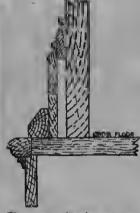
Section of Curb and, Base Moulds of Pulpit on Church Floor.
